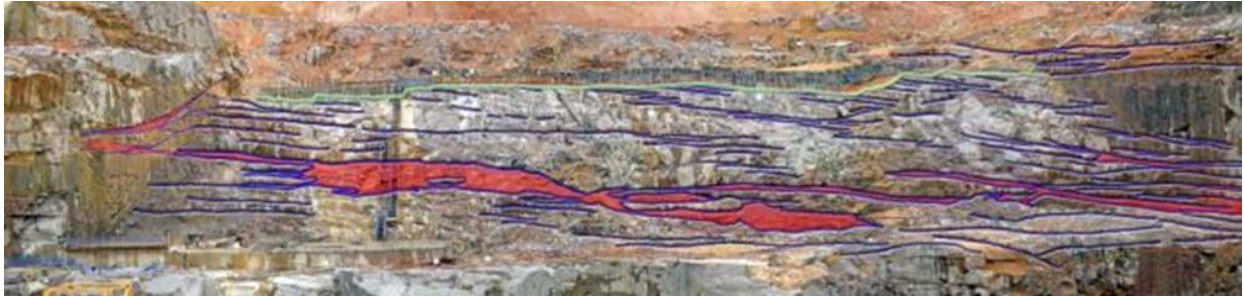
Master joint and discontinuity pattern at water intake structure foundations
